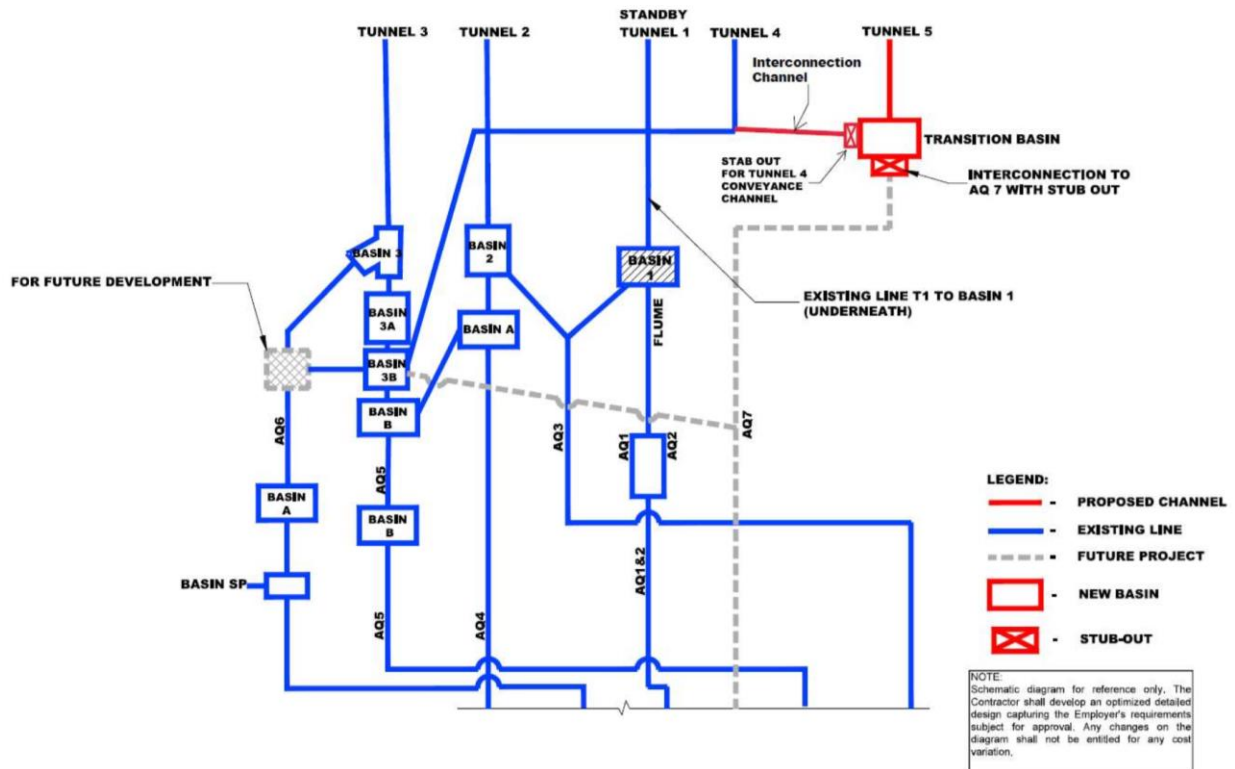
Schematic Diagram of the Proposed Tunnel 5 Transition Basin Connection
